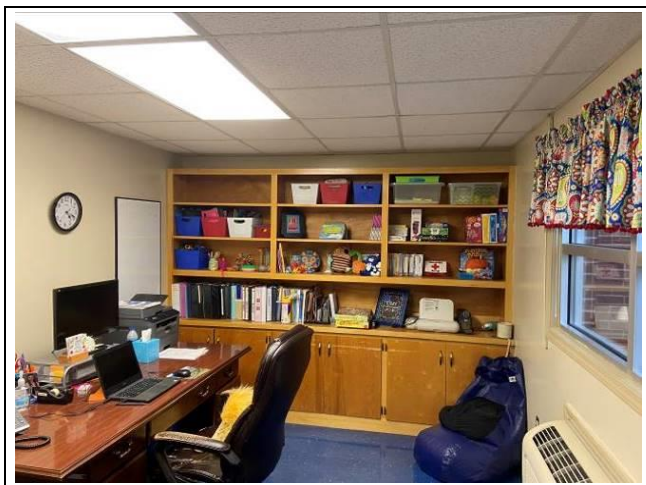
View of assumed ACBM 2'X2' white ceiling tile with pinholes throughout the school.
